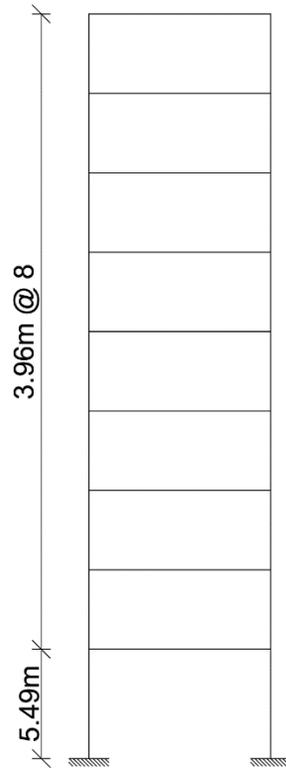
Elevation scheme of the simplified 9-story shear-type building from Cimellaro et al. [9]
